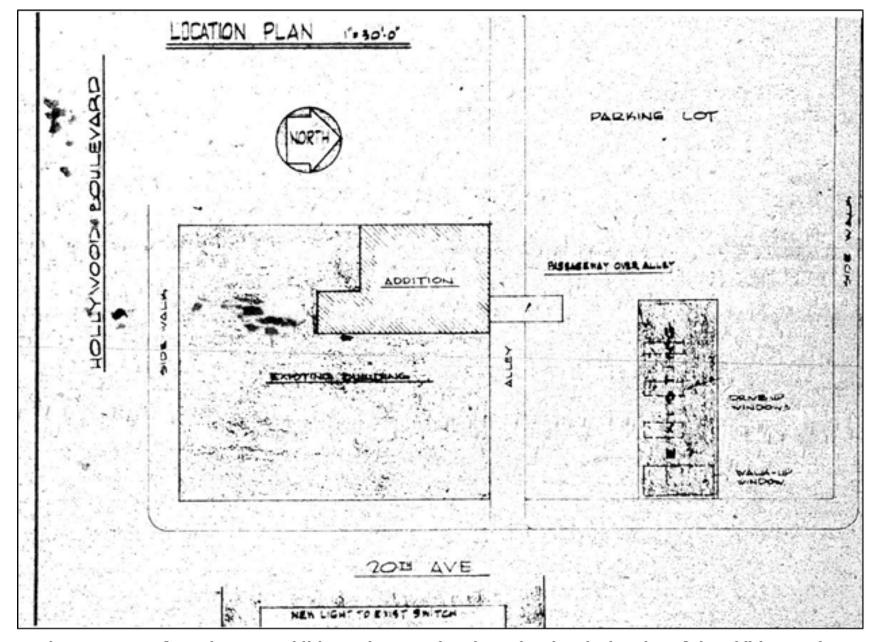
Page from the 1965 Addition and Renovation plans, showing the location of the addition on the northeast corner of the building (City of Hollywood Records and Archives).
